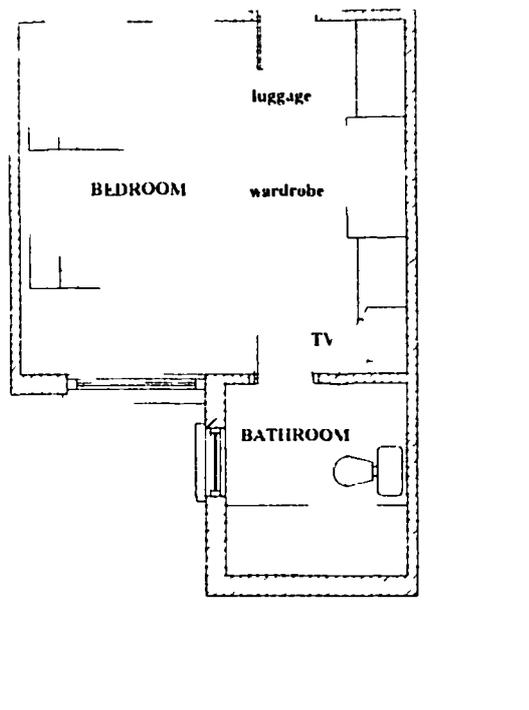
Typical layout of bedroom (adapted from Shields [5])
